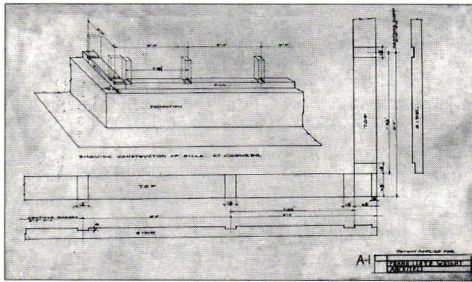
ASBH standardized balloon frame detail: the pre-notched sole plate.
